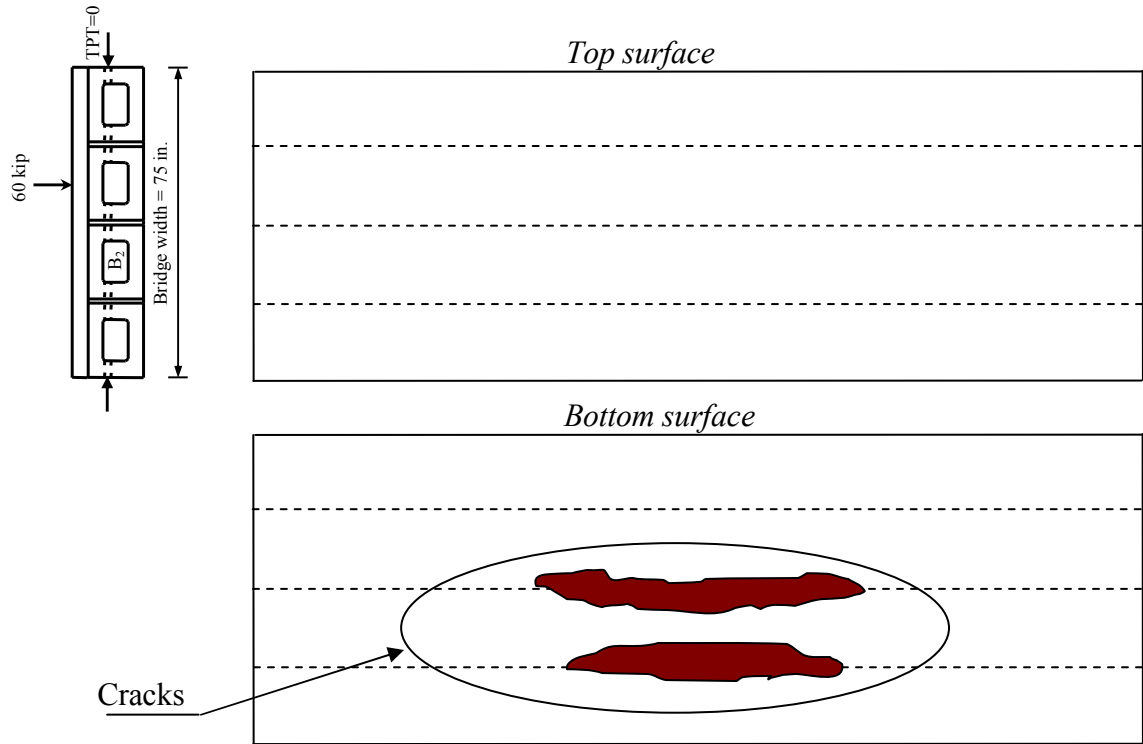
Crack development in the slab under vertical load of 60,000 lb.
